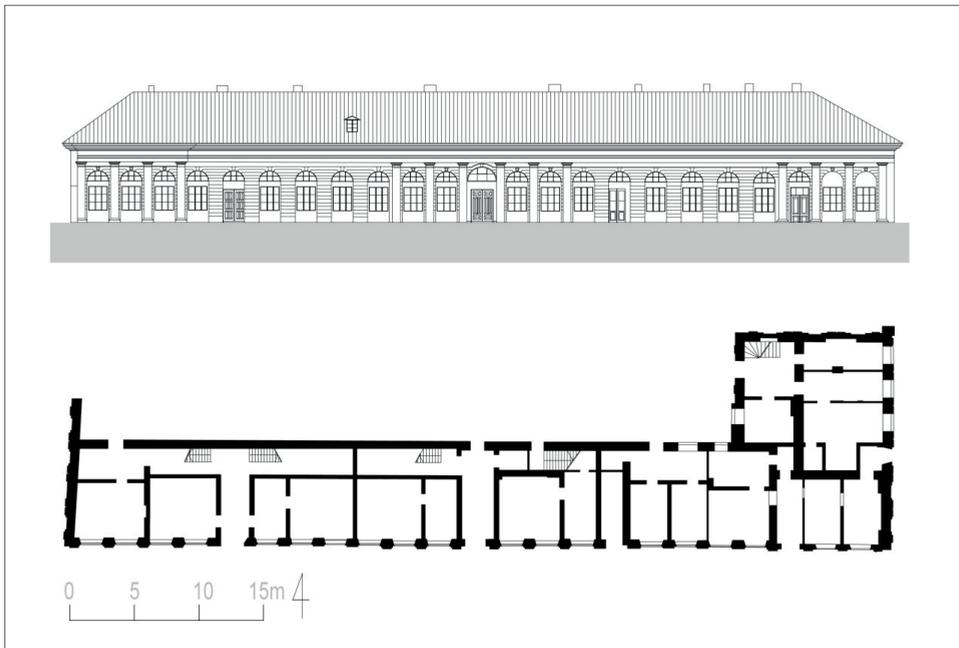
The schematic plan and façade of the hothouse in Lubartów, author's own elaboration
